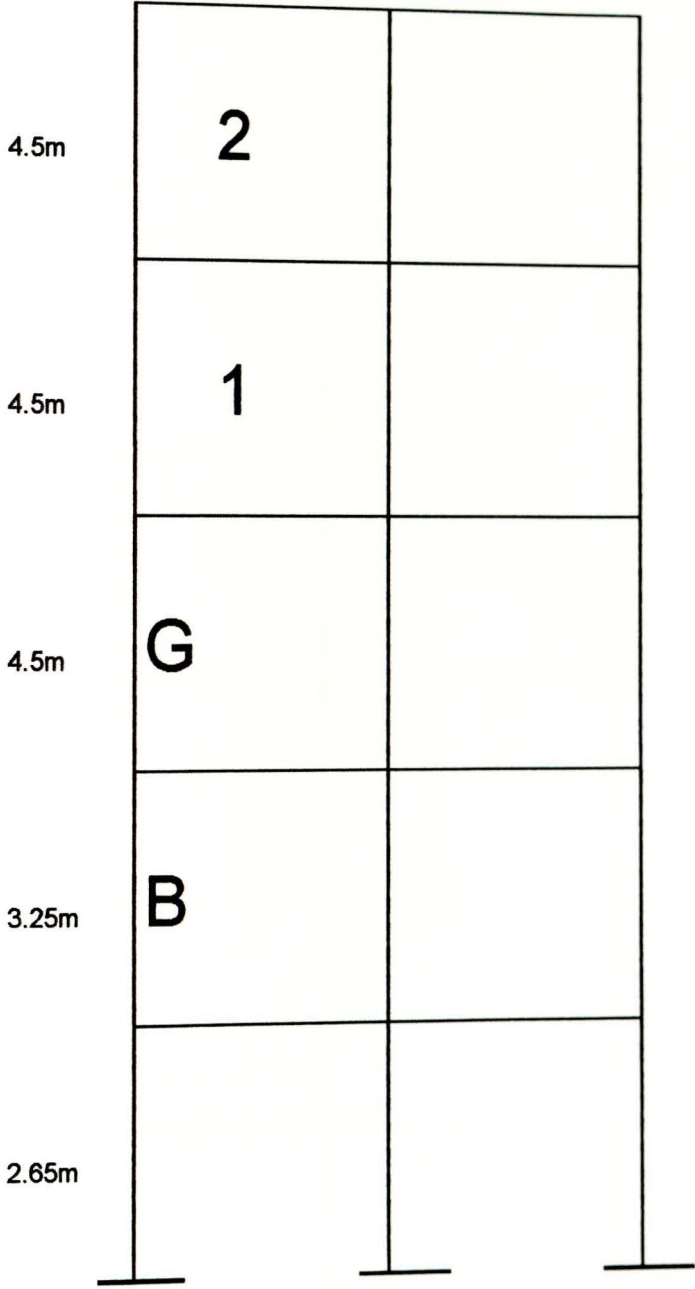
TELECOMMUNICATION EXCHANGE BUILDING ELEVATION (OLD).
